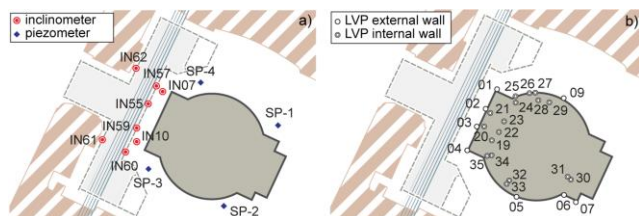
Monitoring system: a) inclinometers and piezometers; b) levelling points.
